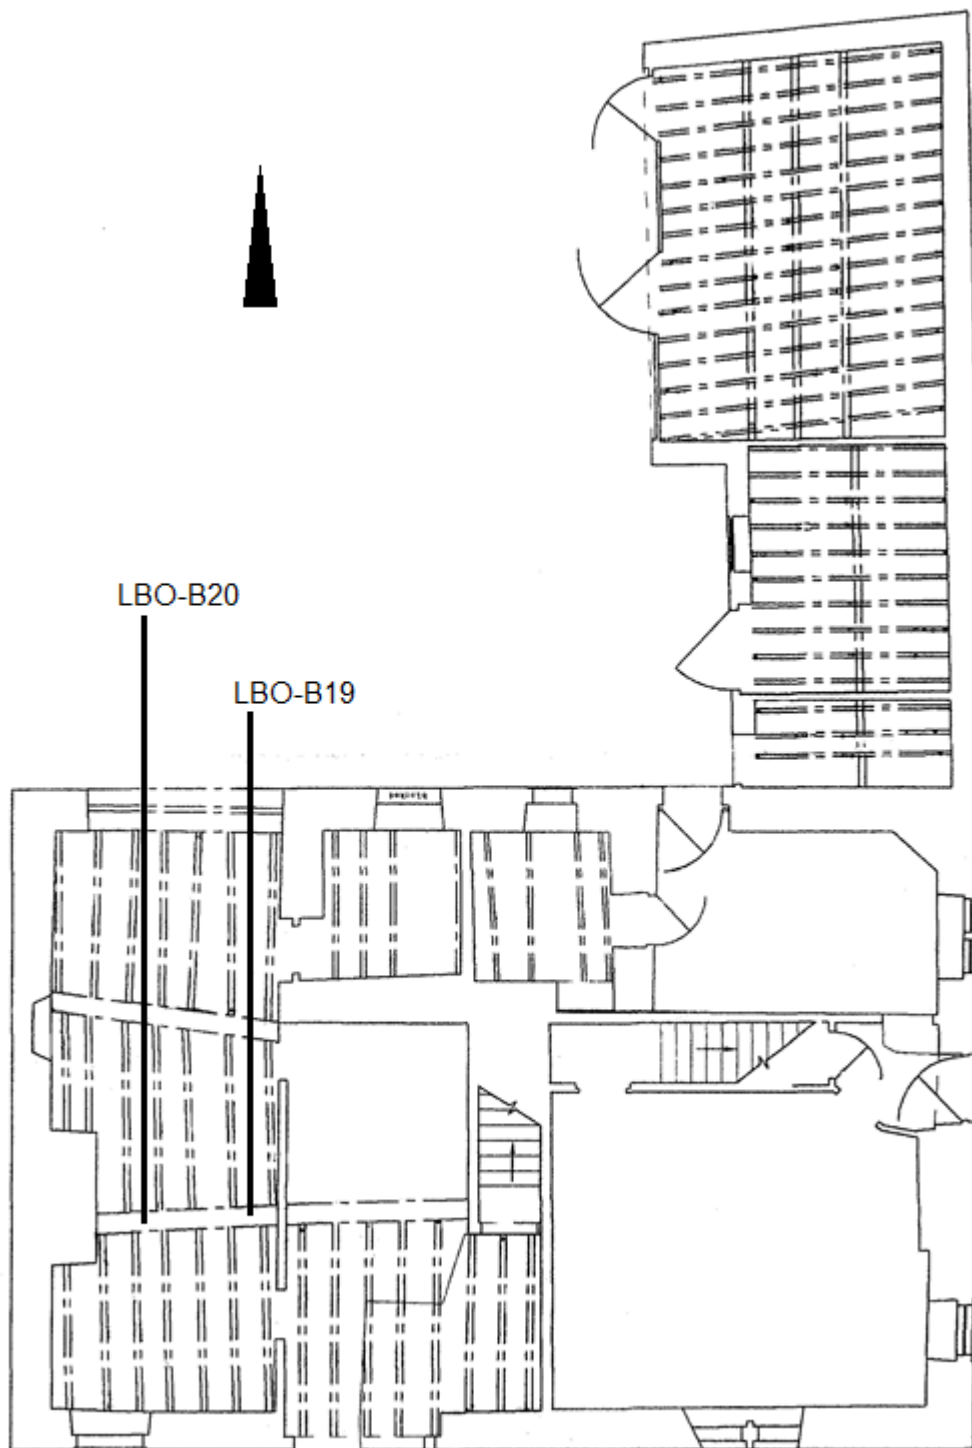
Former farmhouse, ground floor plan, showing the location of samples LBO-B19 and LBO-B20 (Peter Harrison Architects)
